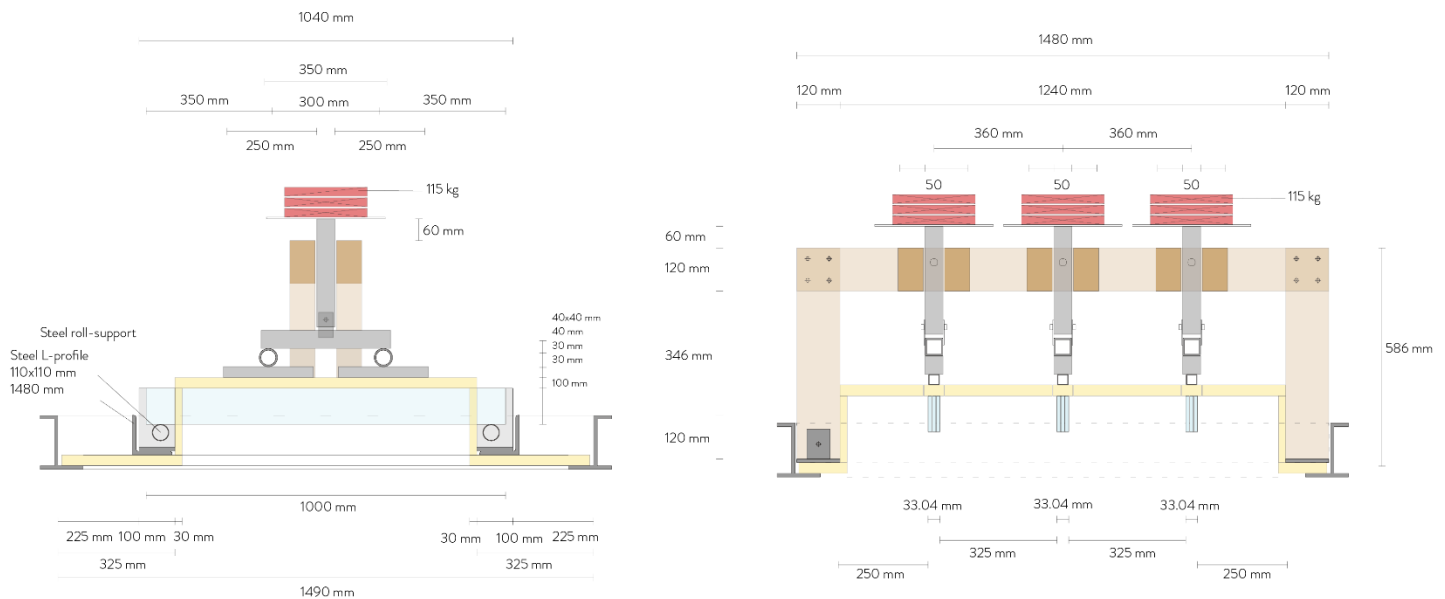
Longitudinal section of the test set-up showing 3 beams positioned above the oven.
